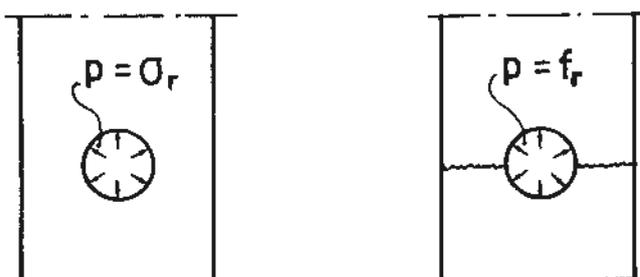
Principle for splitting failure in a concrete cross section loaded with an internal pressure
